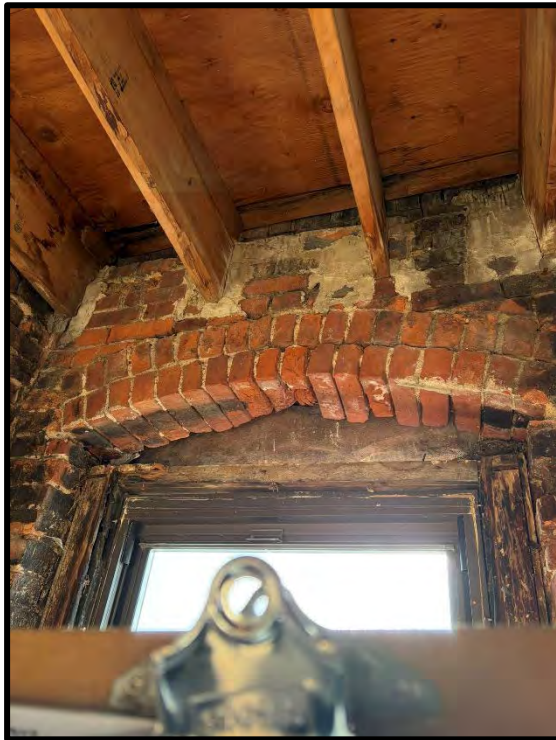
(left) Sixth floor interior façade and window header. Open mortar joints and loose brick visible
